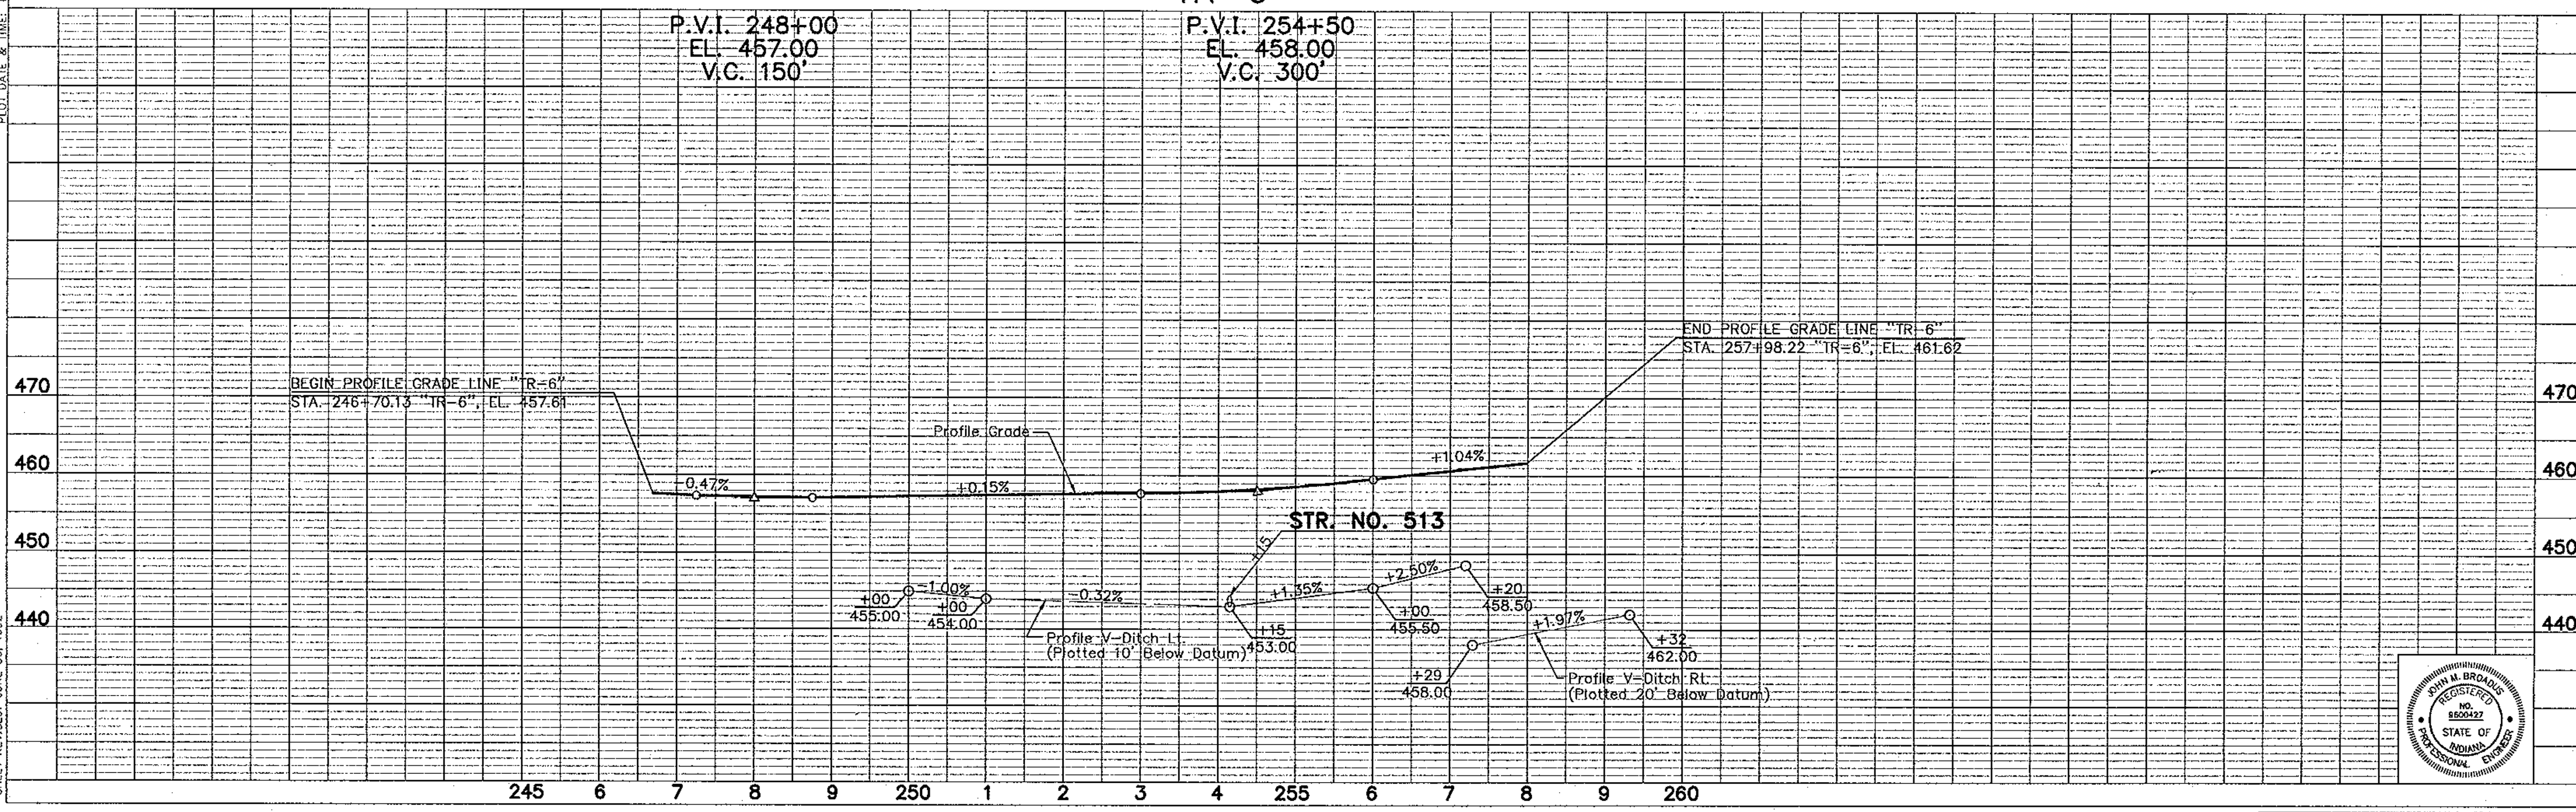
PLAN - PROFILE B. R. R. STANDARD 1975
